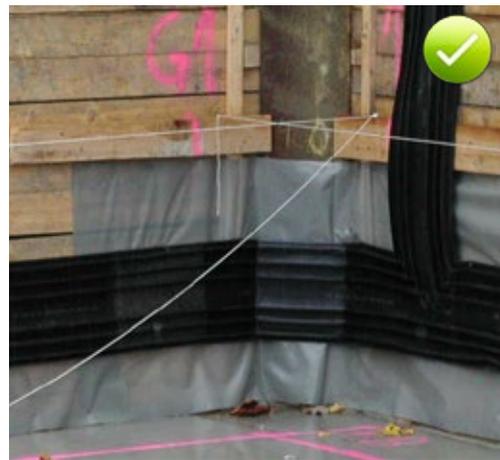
External construction joint waterbar fixed to the wall formwork
